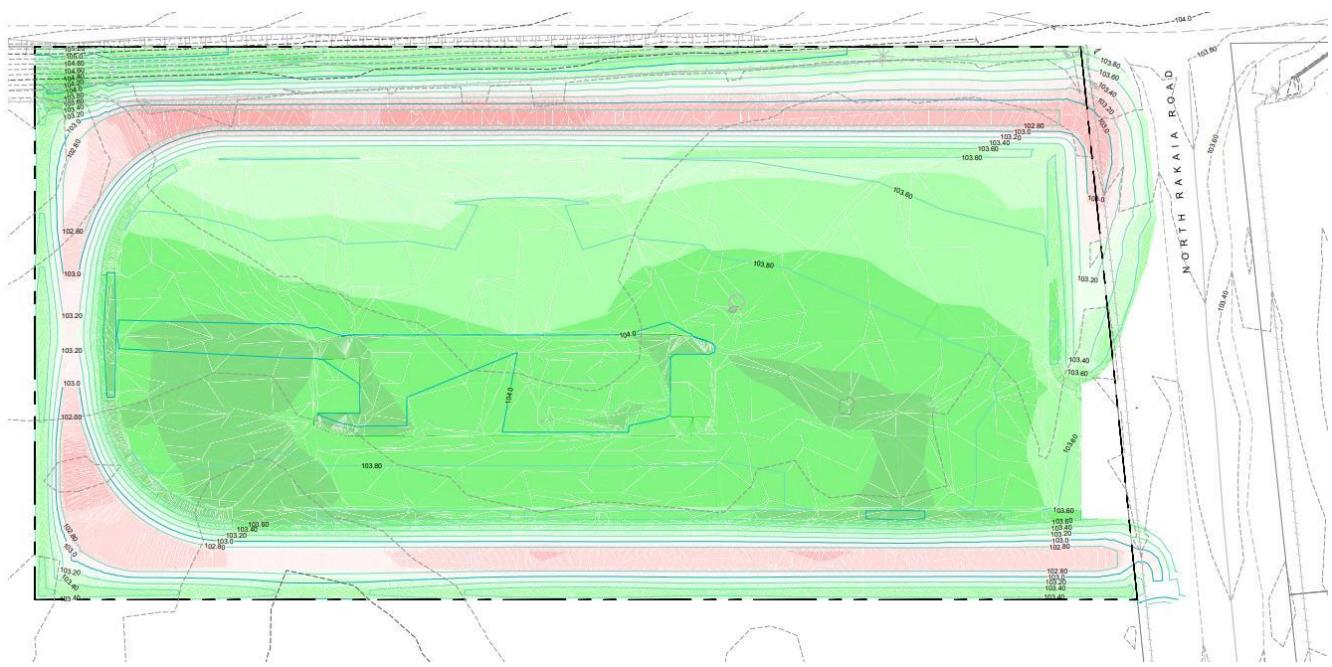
Finished site contour following the construction of the CVSC on Designation TR7. (Source: WSP).
